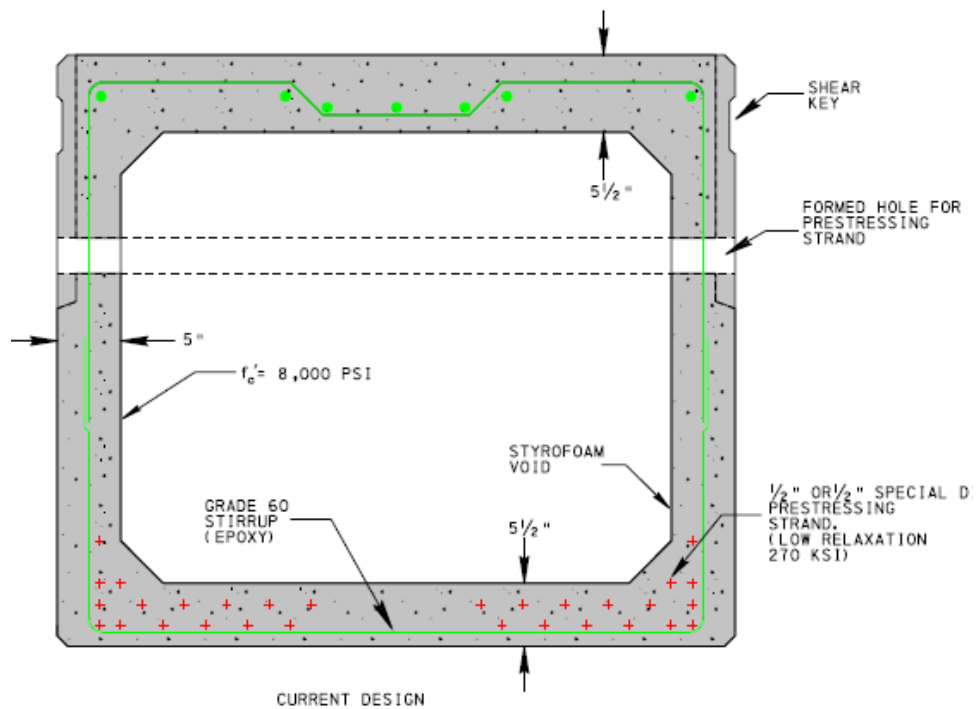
PennDOT Modern Noncomposite Adjacent Prestressed Concrete Box Beam
